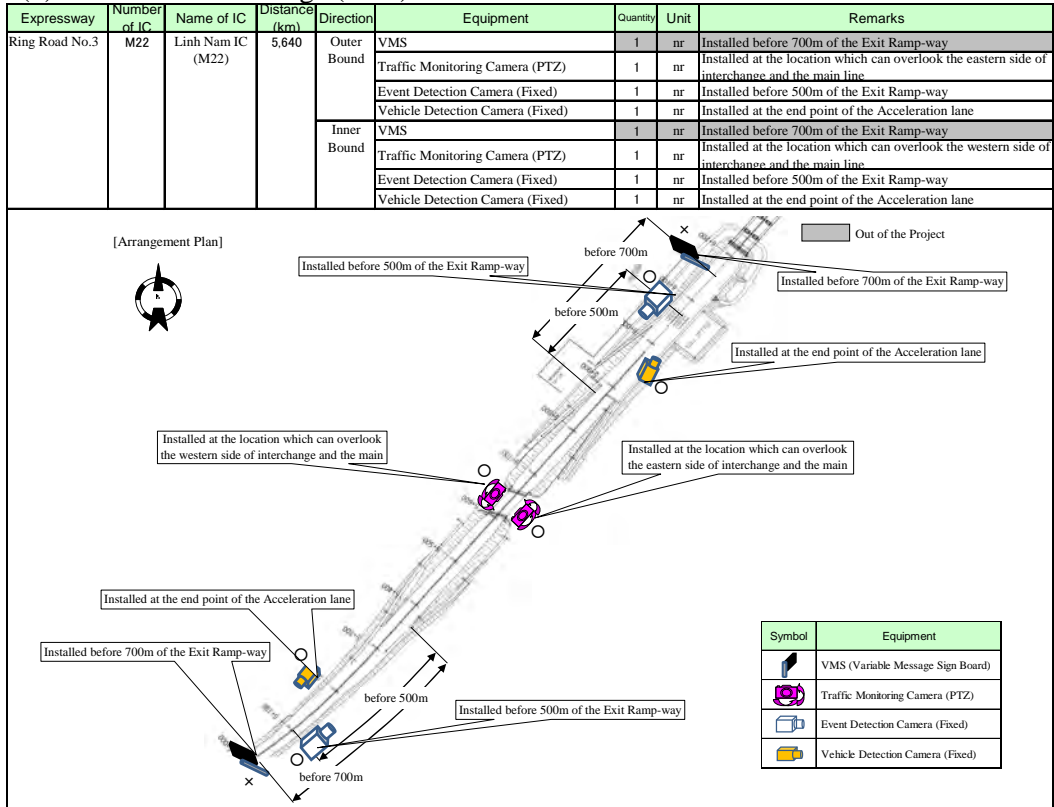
Equipment Layout Plan at Linh Nam Interchange
